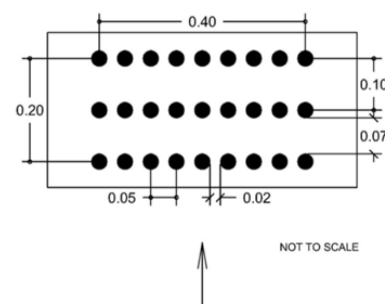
Plan of Oyster Reef Pile Structure in Rectangle Pattern – Module 1
